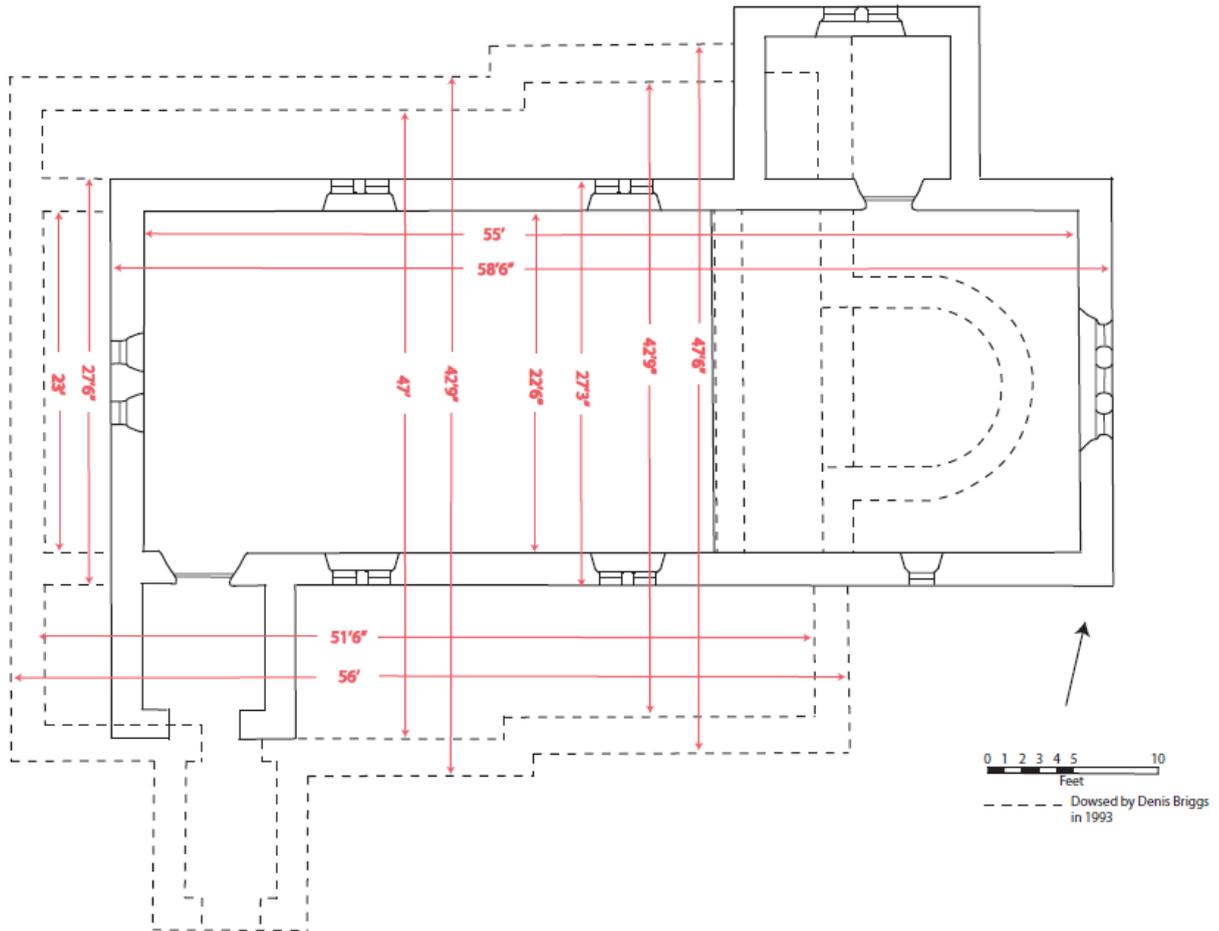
Plan of All Saints Church after Denis Briggs, showing the extent of possible wall footings as suggested by dowsing – dashed lines
